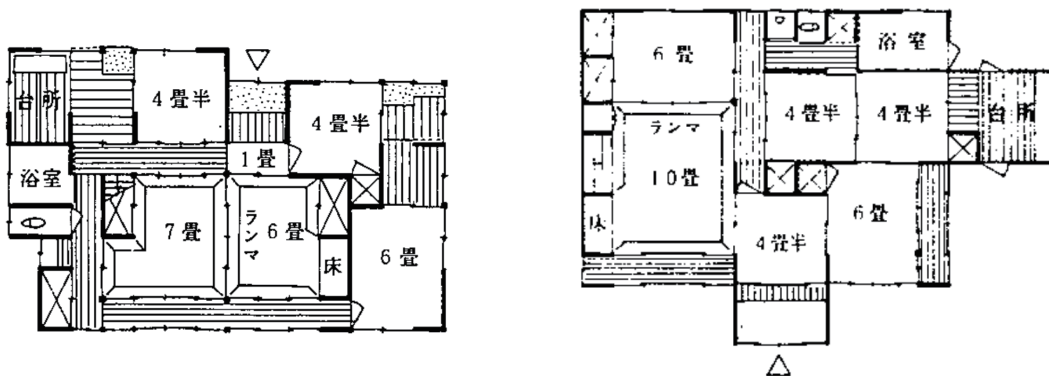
Typical Interior corridor house (left : North entering horizontal type, right : South entry vertical type)
